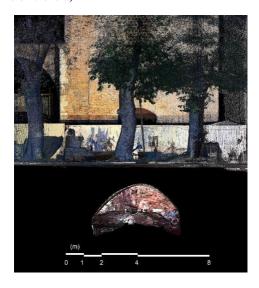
Section 4-4: Northeast-southwest cross-section of the first vault.
